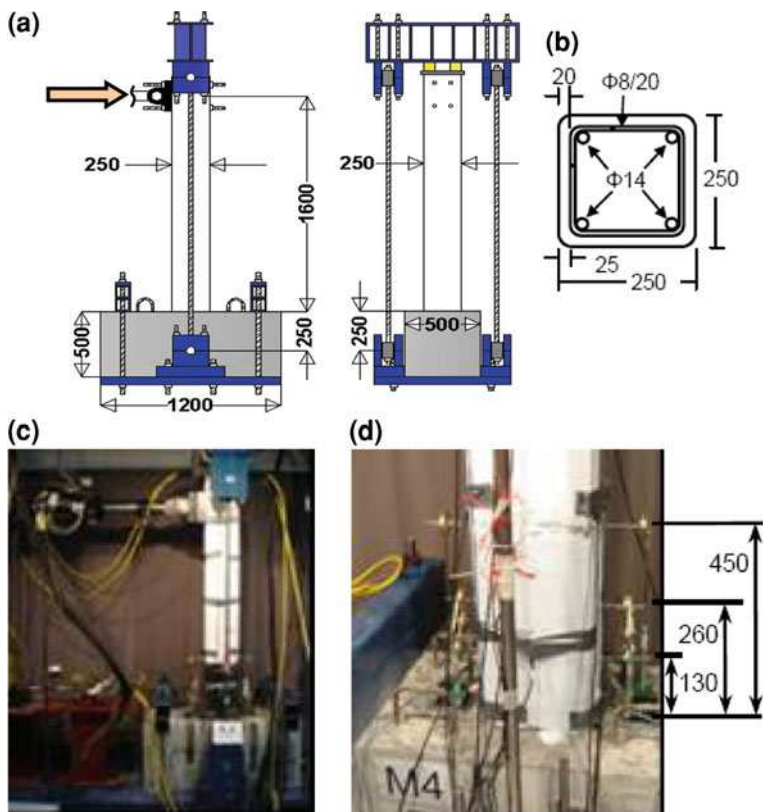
a Geometry of the columns. b Details of cross-section. c General set-up of the test. d Position of displacement transducers (all dimensions in mm)
